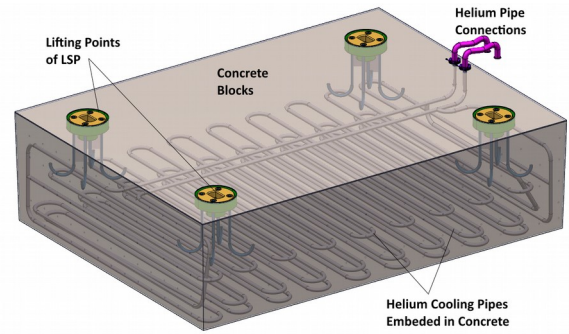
Structure of lower shielding plug (LSP), without showing concrete reinforcement
